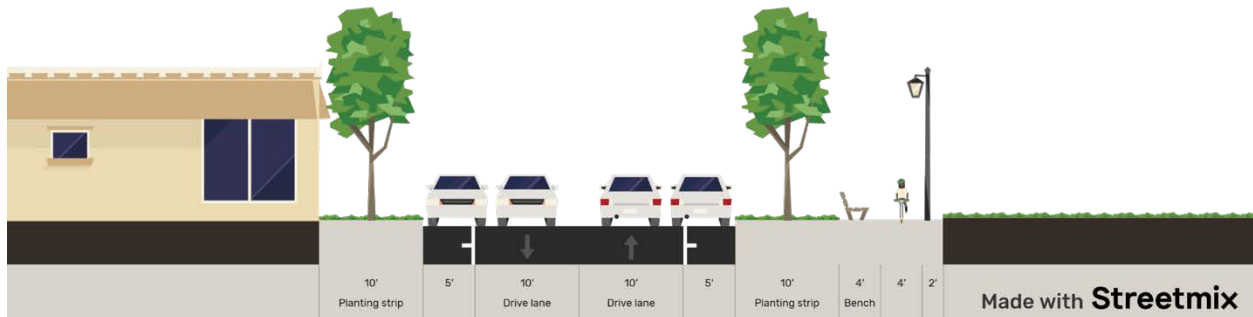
A cross-section of West 45th Street looking east. Diagram created in Streetmix by EC, 2022.
